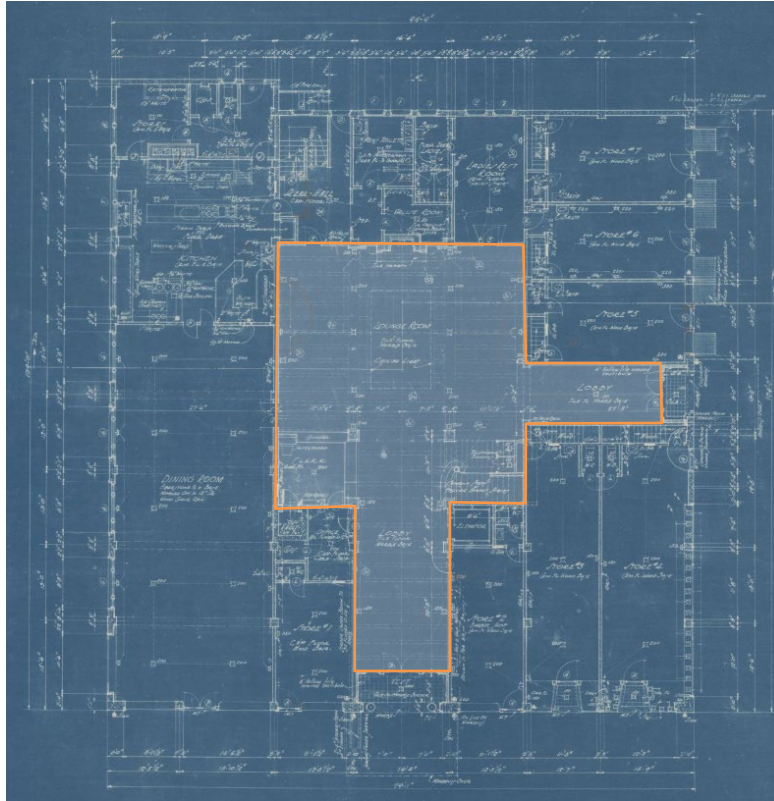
Plan of first floor; lobby and lounge outlined in orange.
